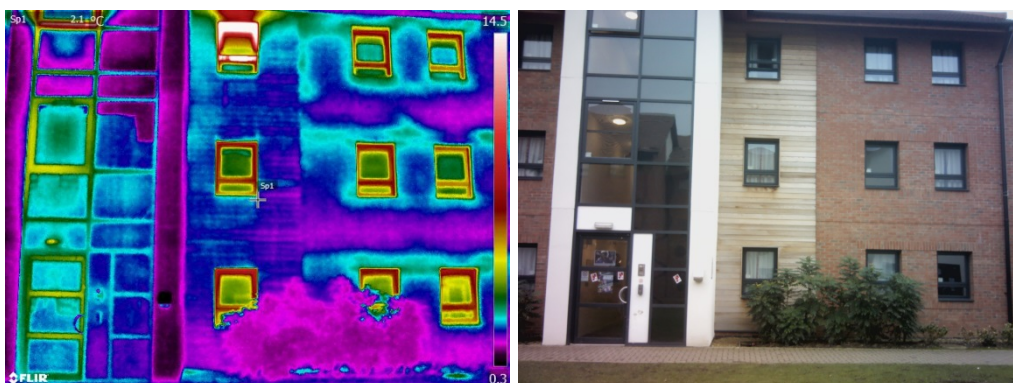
IR thermal image showing no evidence of lintels in timber clad section of wall
